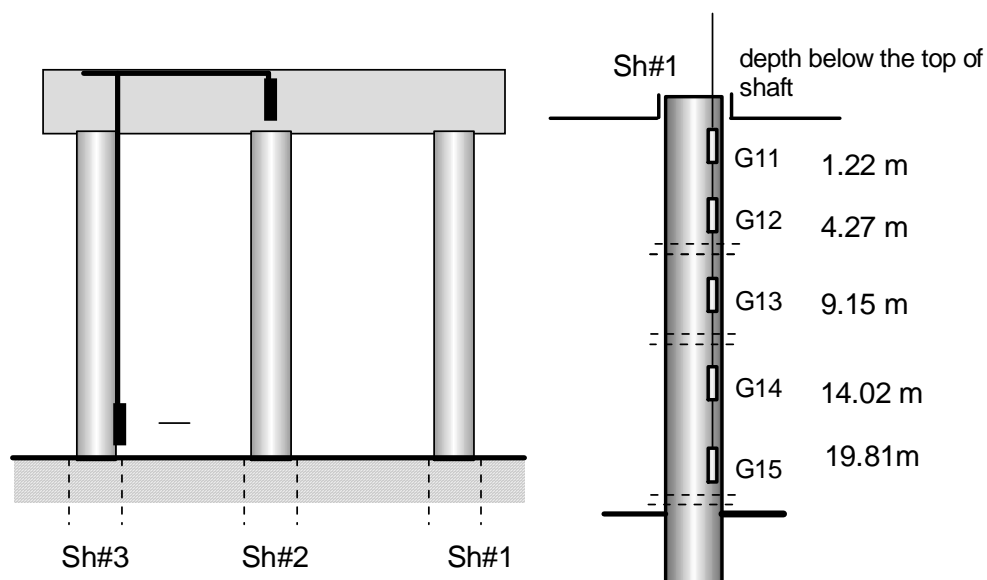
Schematics of the Instrumented Drilled Shaft, Pier and Pier Cap
